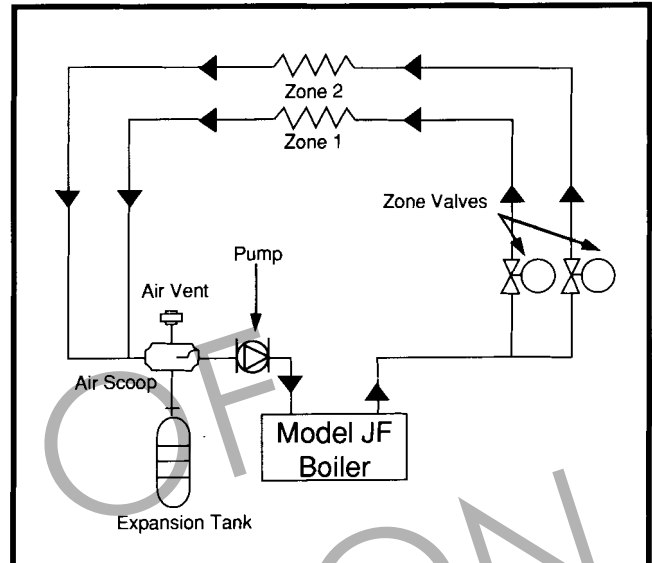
Zoned Piping System Utilizing Individual Zone Valves
